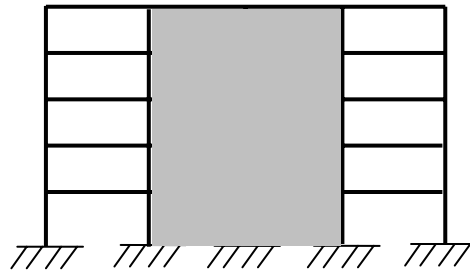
Retrofit 1: Shear walls added to exterior frame
